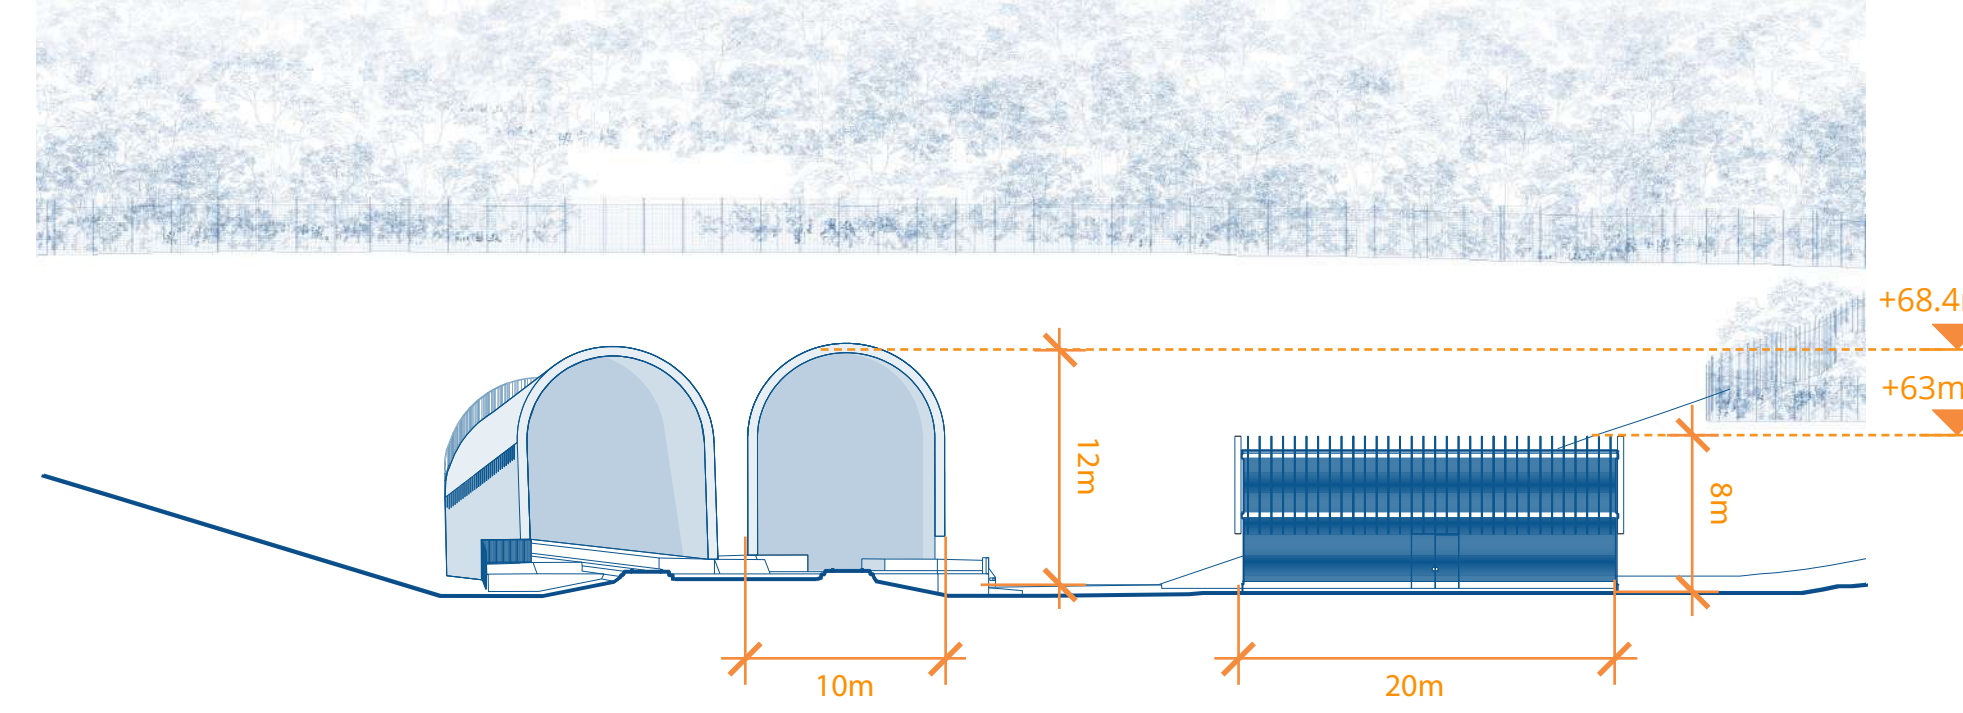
\_Proposed south-east elevation - Key dimensions of portal structure and compound building
